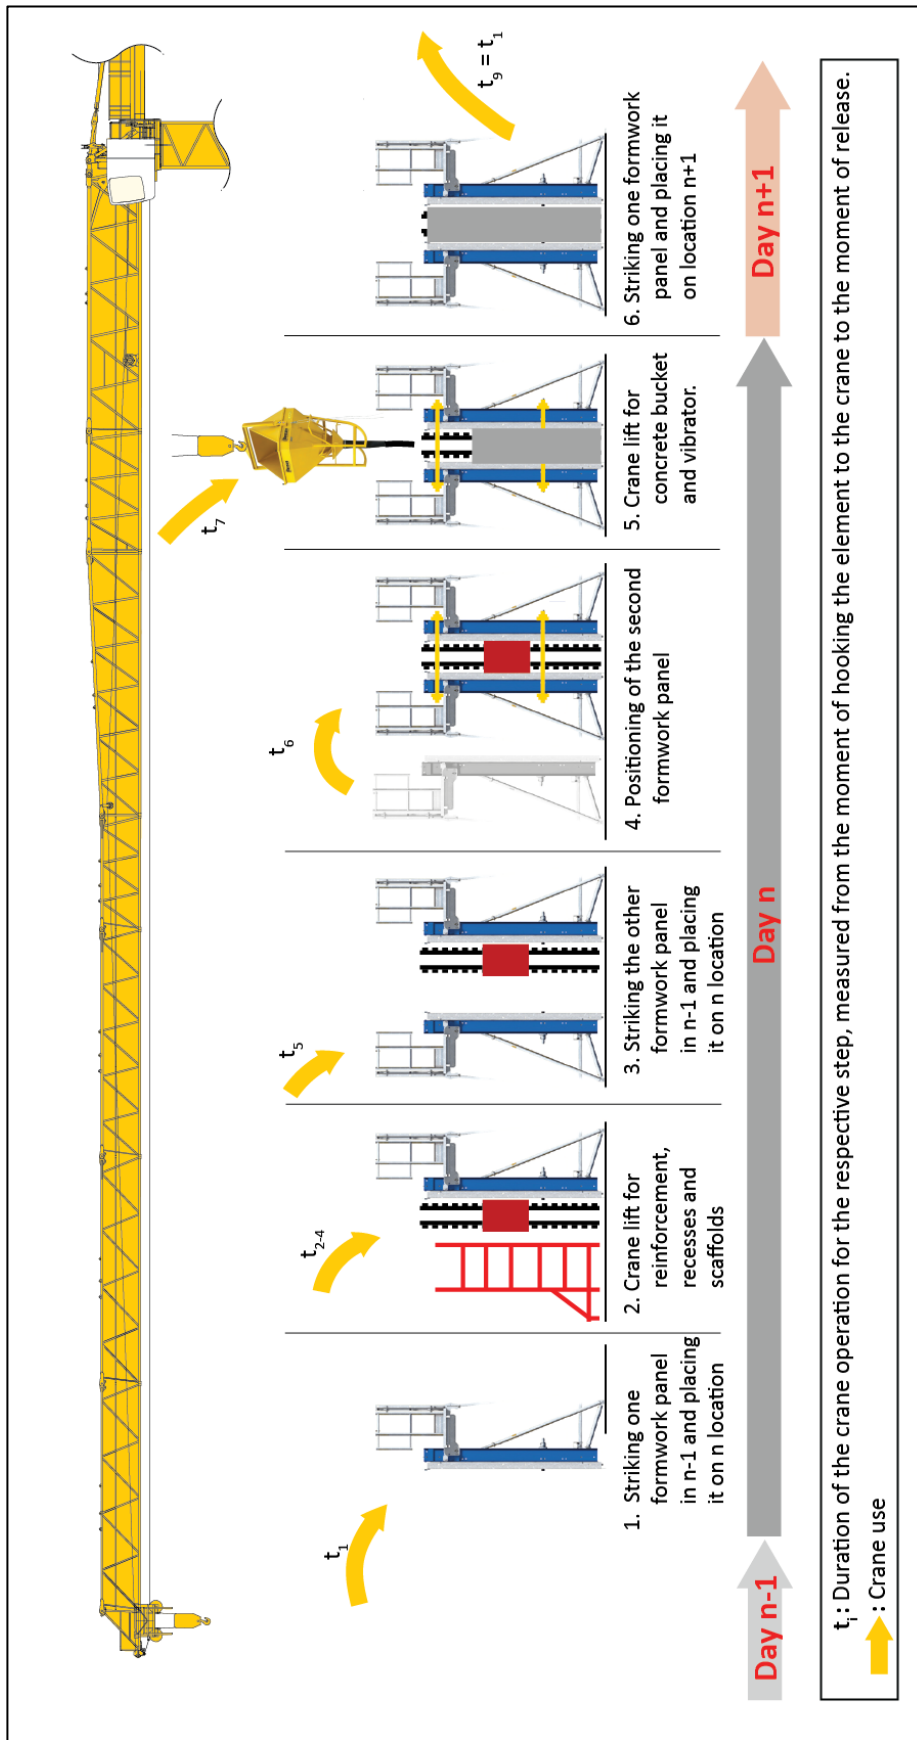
Crane use in the production of a wall section [M. Schäfer]
